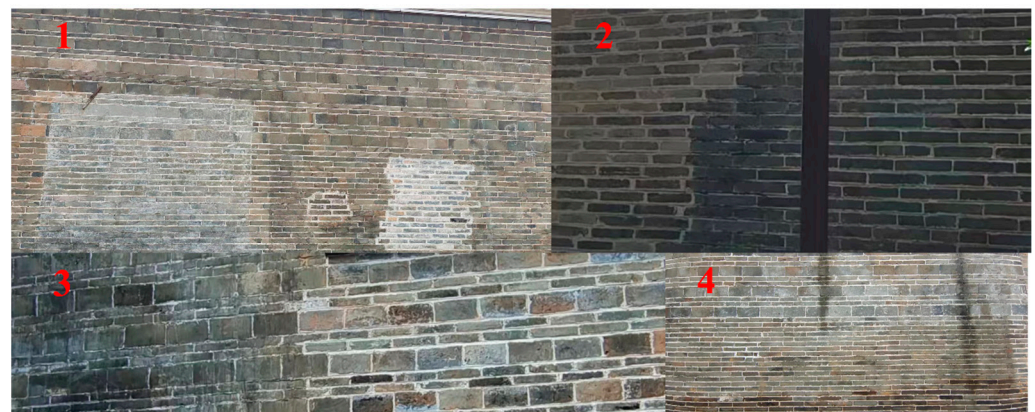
Four sections of wall restoration in Qi Li Ancient Town.
